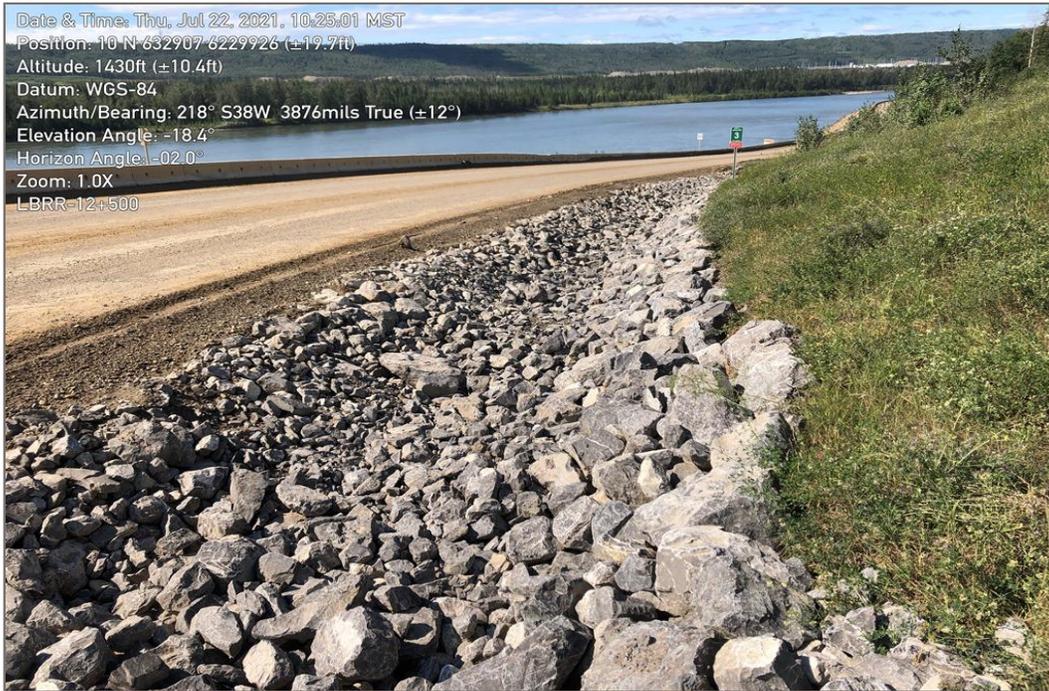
River Road LBRR-12+810 location, July 22, 2021.
